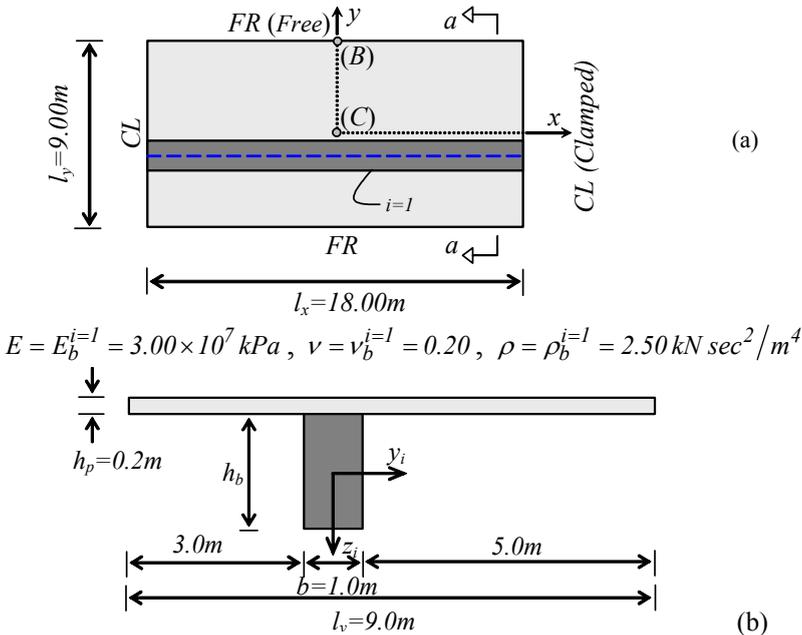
Plan view (a) and section a-a (b) of the stiffened plate.
